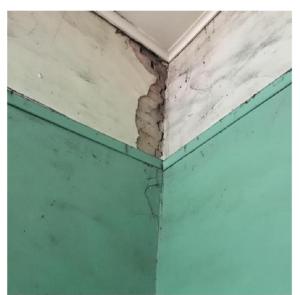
Large cracking in room 4 where brick wall meets each other at corner. Was not overserved and documented in previous report.
